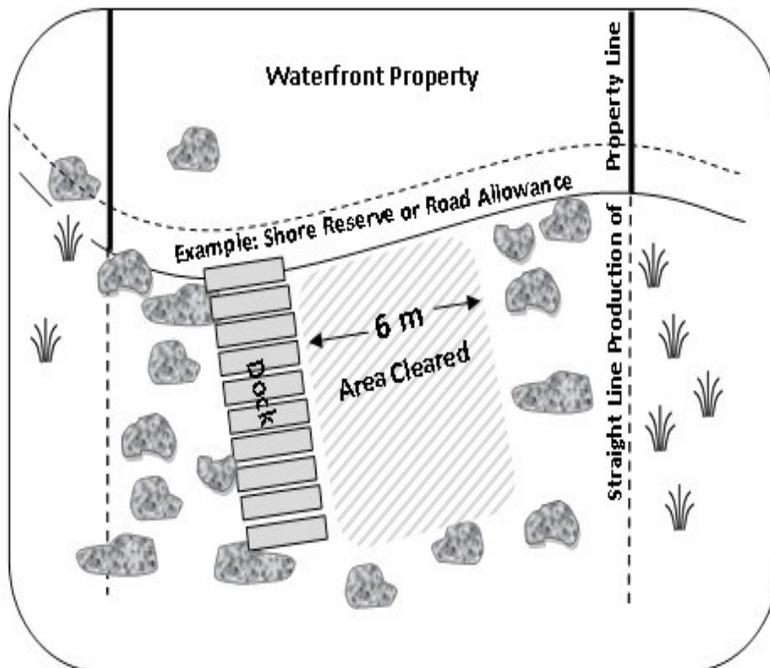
Relocating Rocks on Shore lands — Exempted from Work Permit
